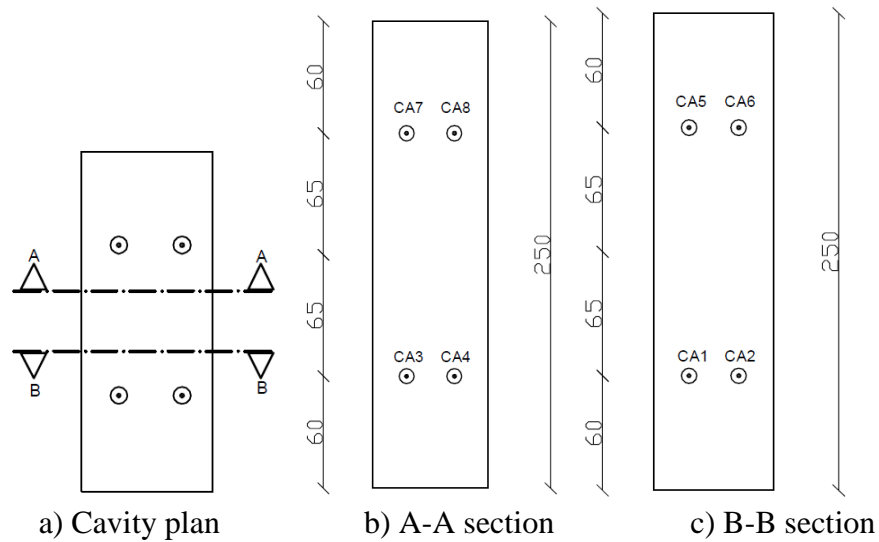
Layout of thermocouples inside the cavity (in cm)
